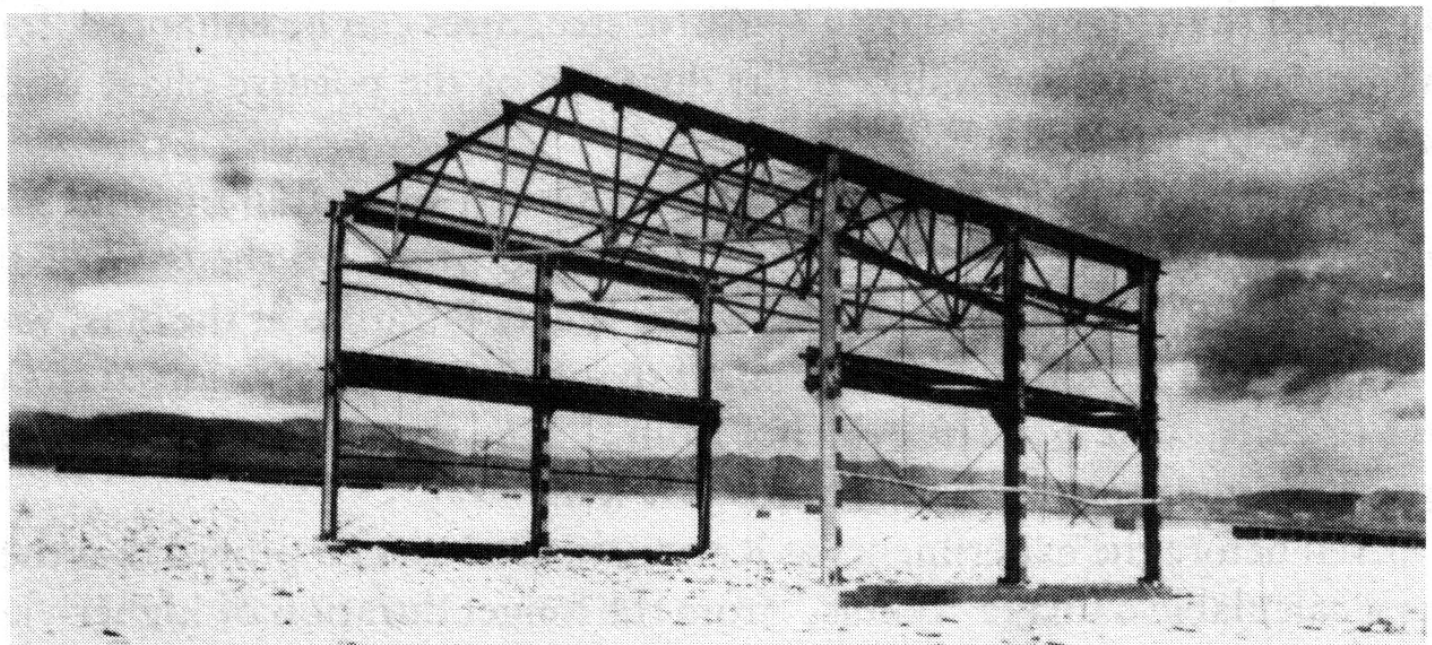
Steel-frame building with concrete siding and window openings of 30 percent of the wall area.
